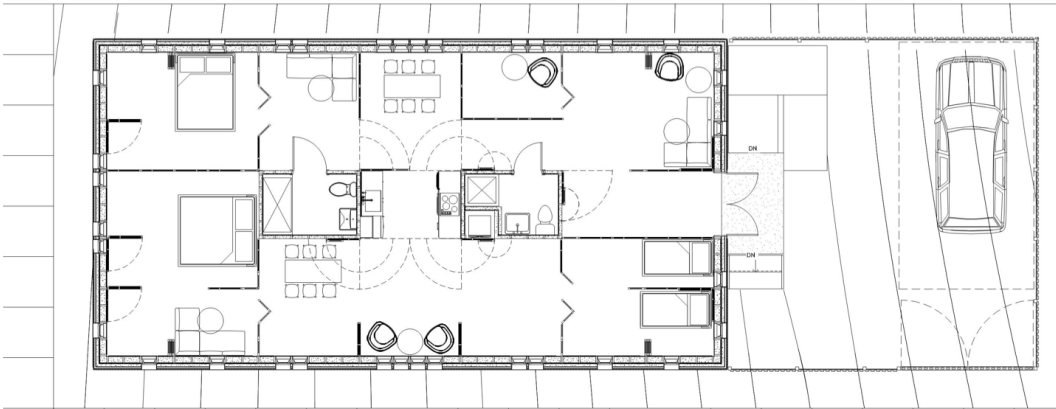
First Floor Plan, Option 1, 4 Bedroom
